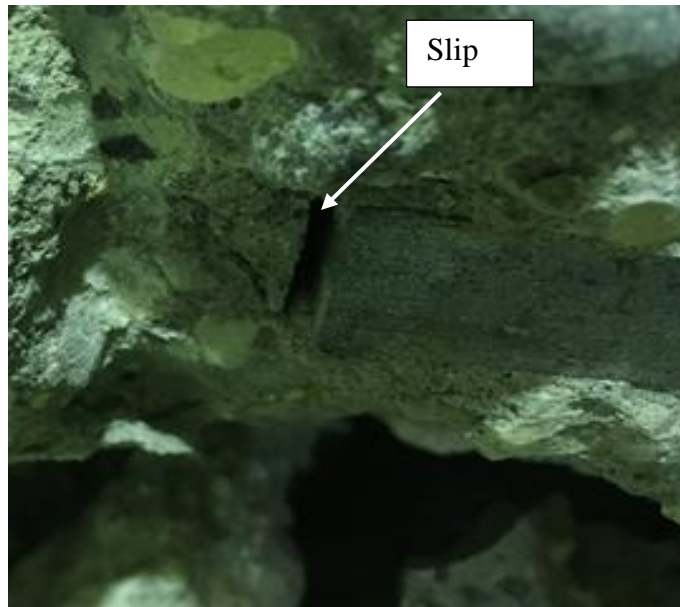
End Slip of Longitudinal Reinforcement Following Concrete Removal for Specimen 19■-510↓
